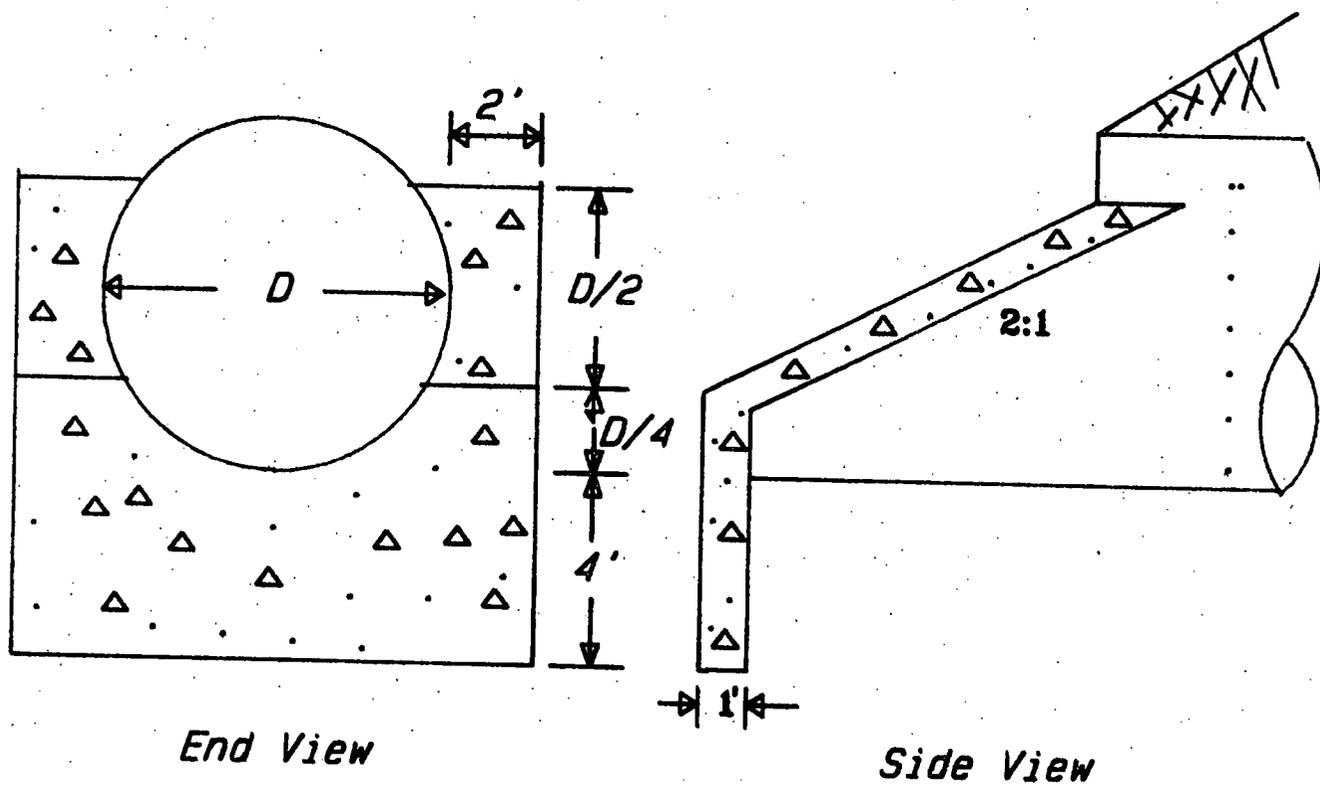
Schematic of headwall currently recommended by Iowa DOT for step beveled inlets
